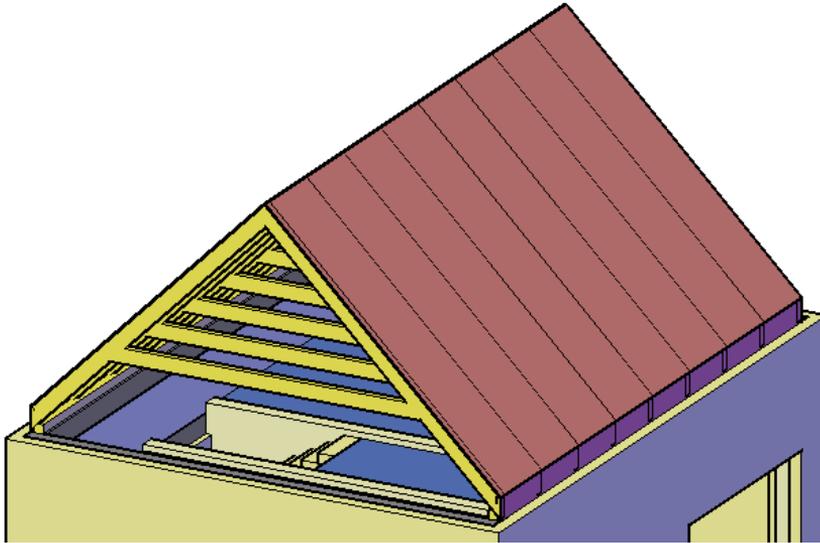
Roof construction covered using OSB (Oriented Strand Boards)
